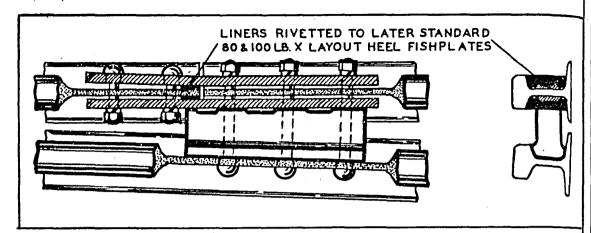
TYPICAL 60, 80&100 B. X LAYOUT HEEL
